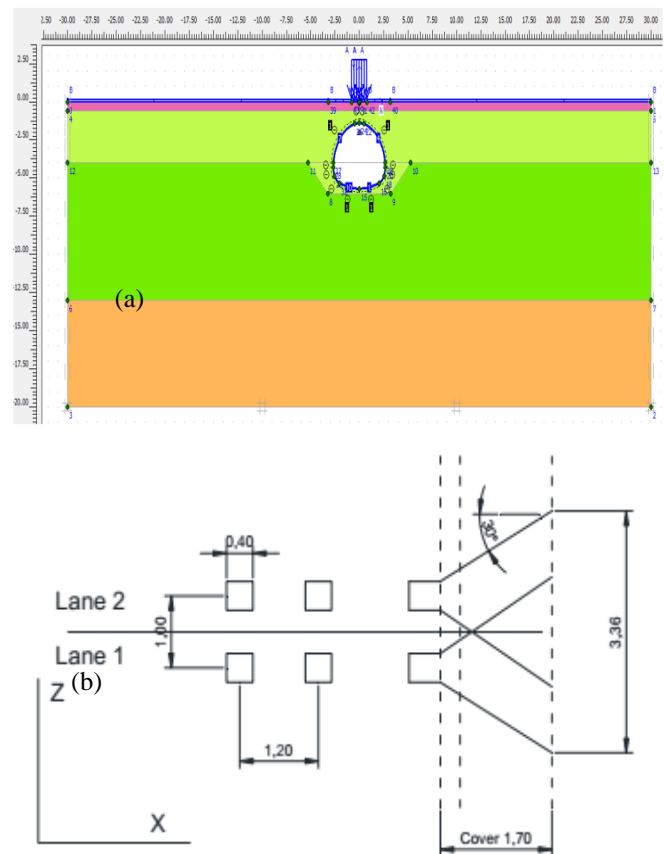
Input FEM (a) geometry, configuration, and loading profile for roadway (b) roadway loading distribution in Z-direction (all dimensions in m).
